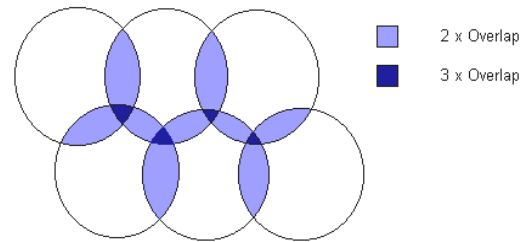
In-situ / Mass treatment column arrangement and overlap.
